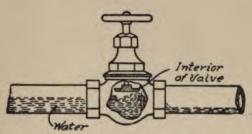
Globe Valve on Horizontal Pipe-Imperfect Drainage.
